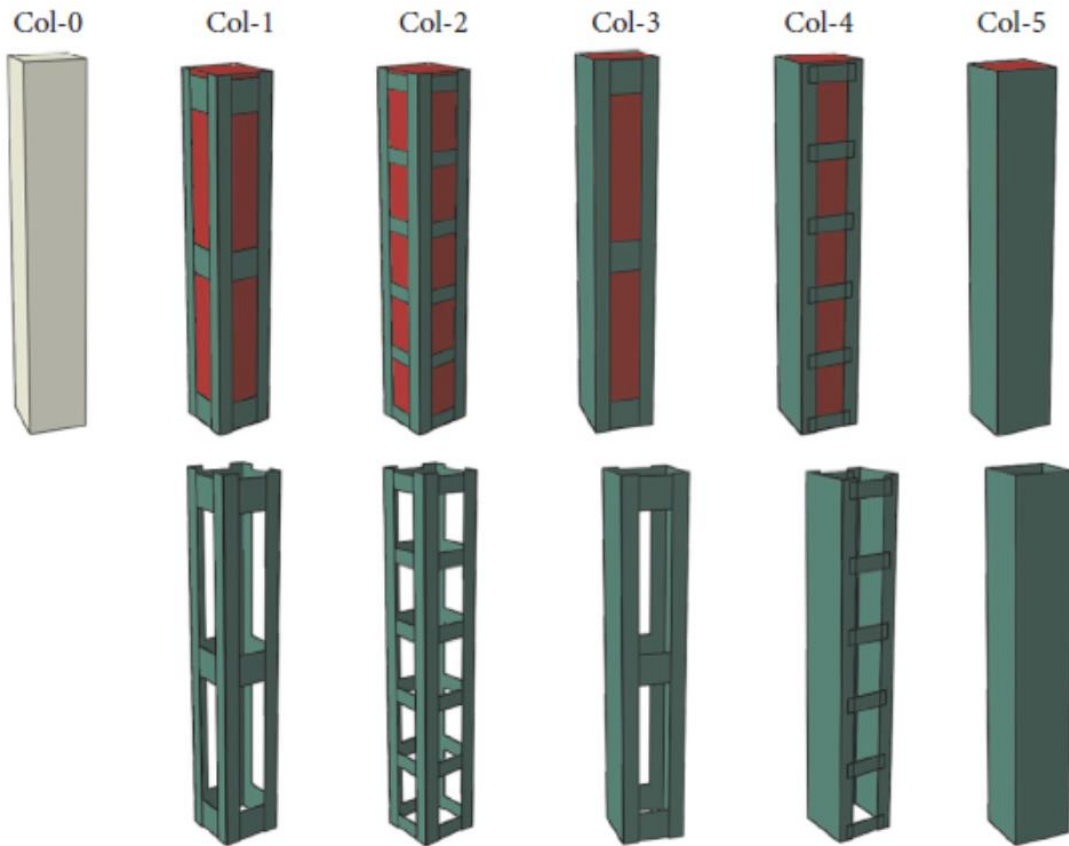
Test specimen and setup and finite element modeling samples (source:[65]).
